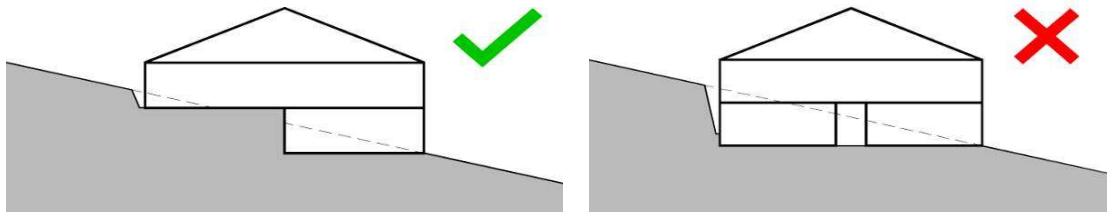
Habitable rooms are to have ample openings to an external wall for air and light.
